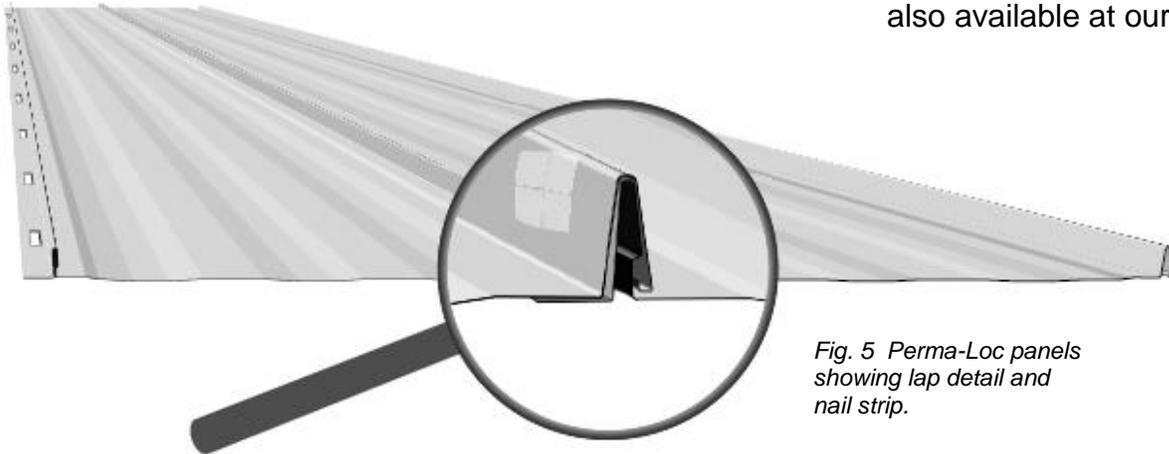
Perma-Loc panels showing lap detail and nail strip.
